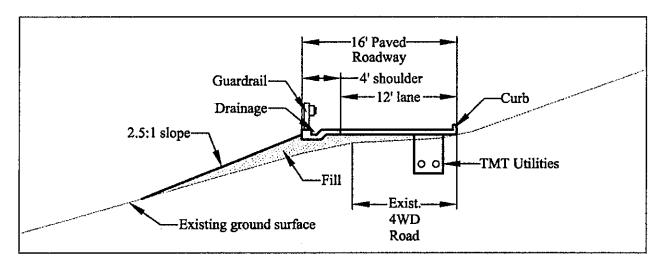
Cross Section of Access Way in Southernmost Cinder Section Overlapping 4-Wheel Drive Road
